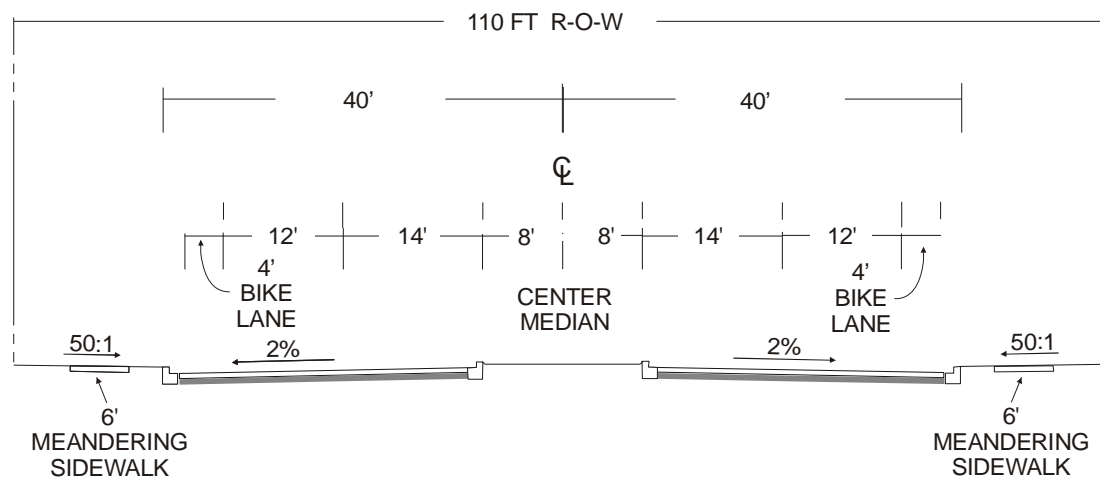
COLLECTOR ROADWAY CROSS-SECTION
